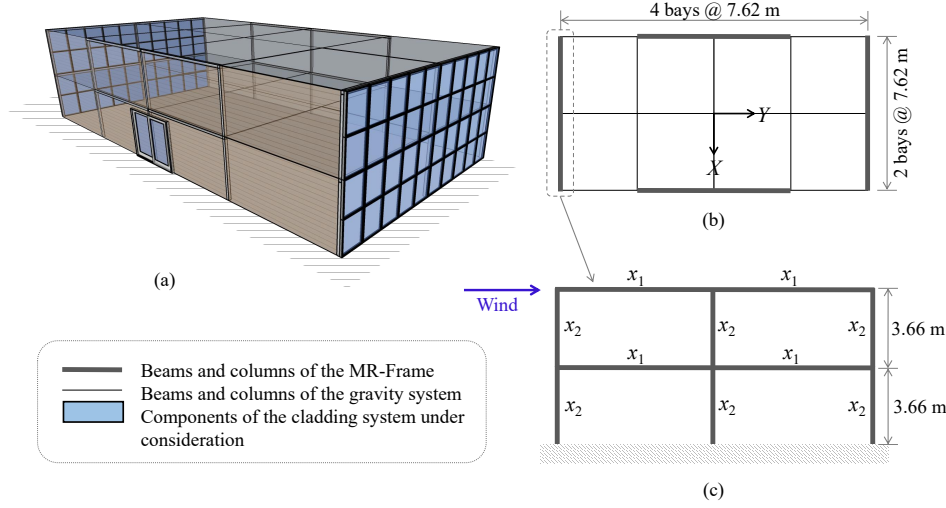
Two-story building system: (a) Isometric view, (b) Building plan, (c) Frame layout showing beam and column assignments.
